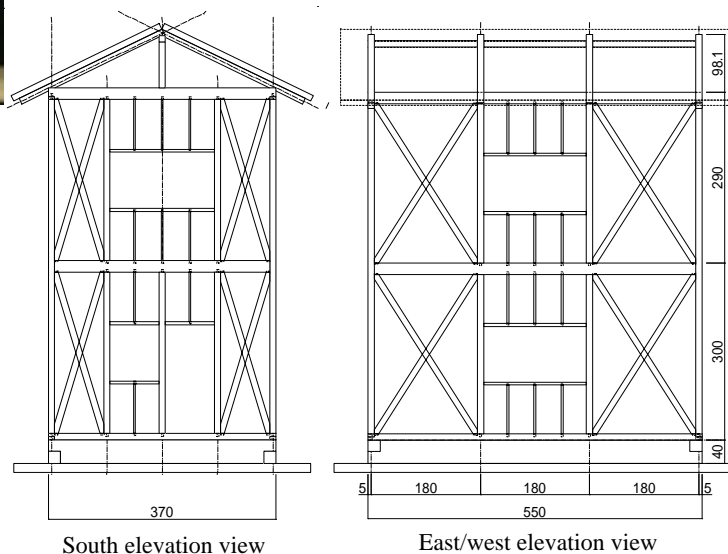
Appearance and dimensions of the 2-story building model of Wooden House Collapse BURURU
